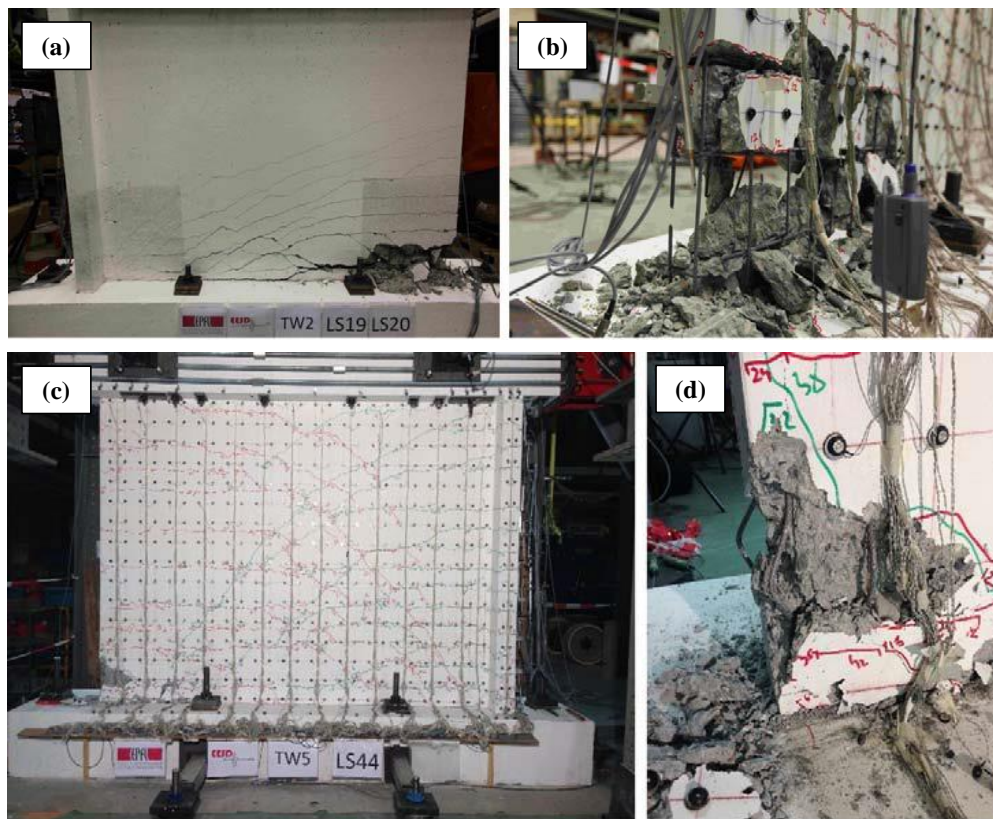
(a) Overview of wall TW2 condition at final load stage LS20, (b) Close-ups at web edge, depicting rebar fracture, (c) General condition of wall TW5 at horizontal failure (loading toward the web edge, at load stage LS44), (d) Detail of the crushing zone, with buckling of longitudinal rebars (Almeida et al. 2017)
